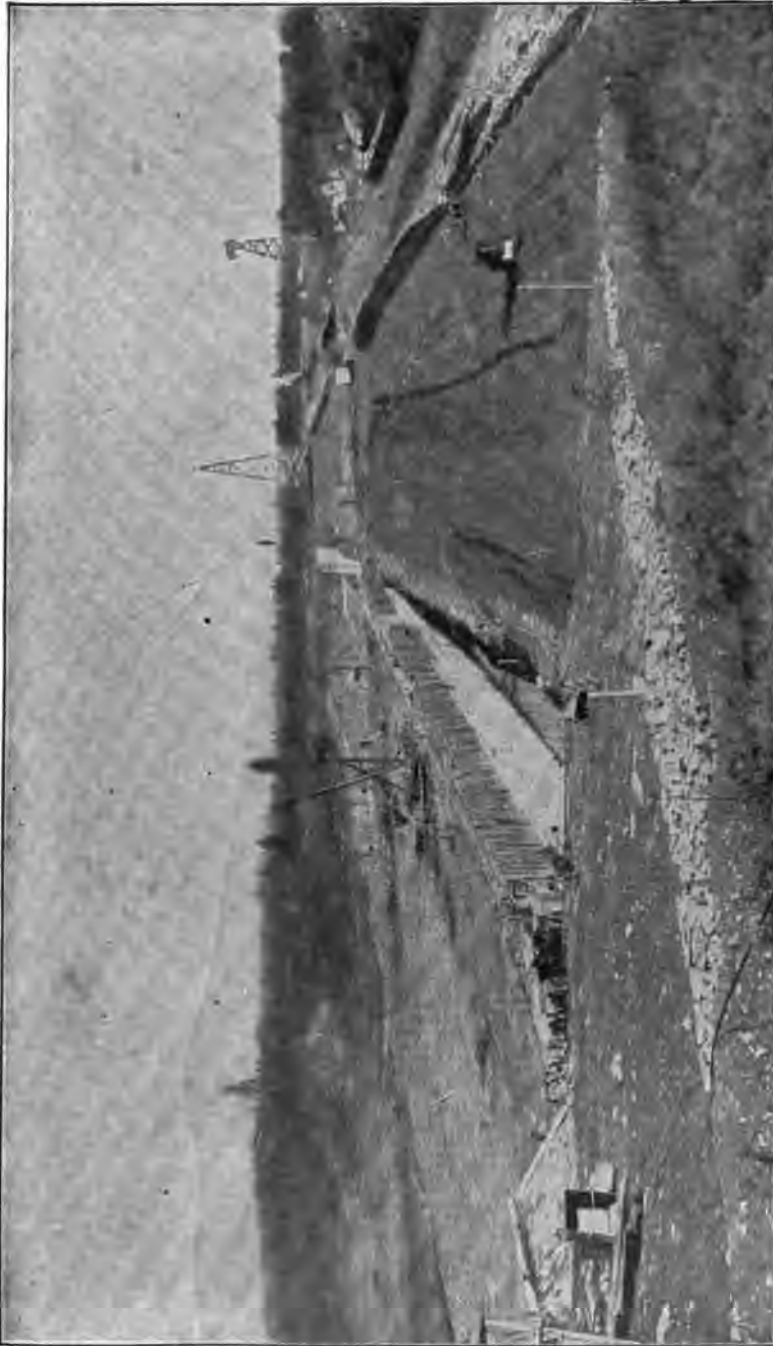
General View of Beaverkill Dikes. Gap in Core Wall Left for U. & D. R.R. Building of Embankment.
